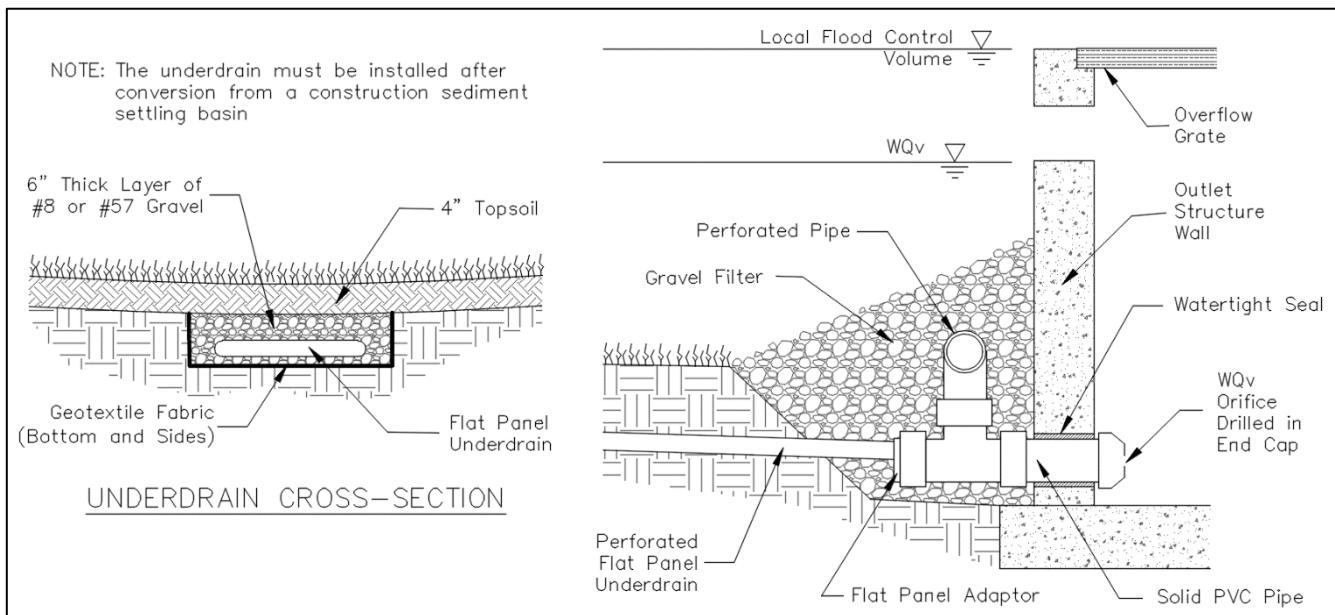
Dry Extended Detention Basin Outlet with Underdrain (after Delaware County Engineer's Office)
